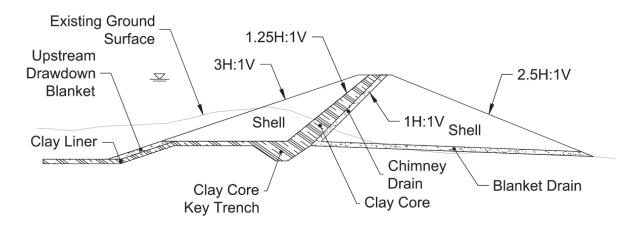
Preliminary Dam Section and Zoning (not to scale).
